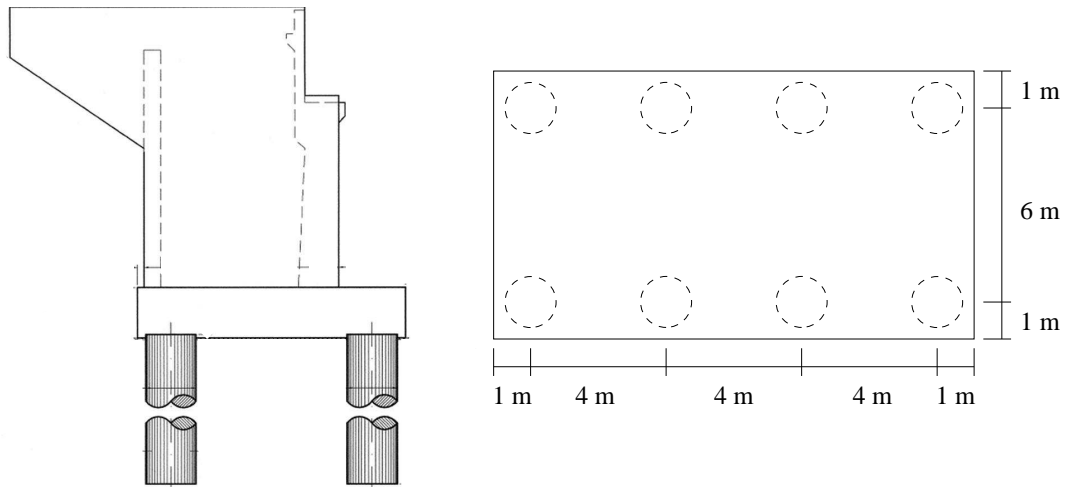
Elevation and plan views of typical abutment for Puente Mataquito (courtesy Ministerio de Obras Públicas, Chile).
